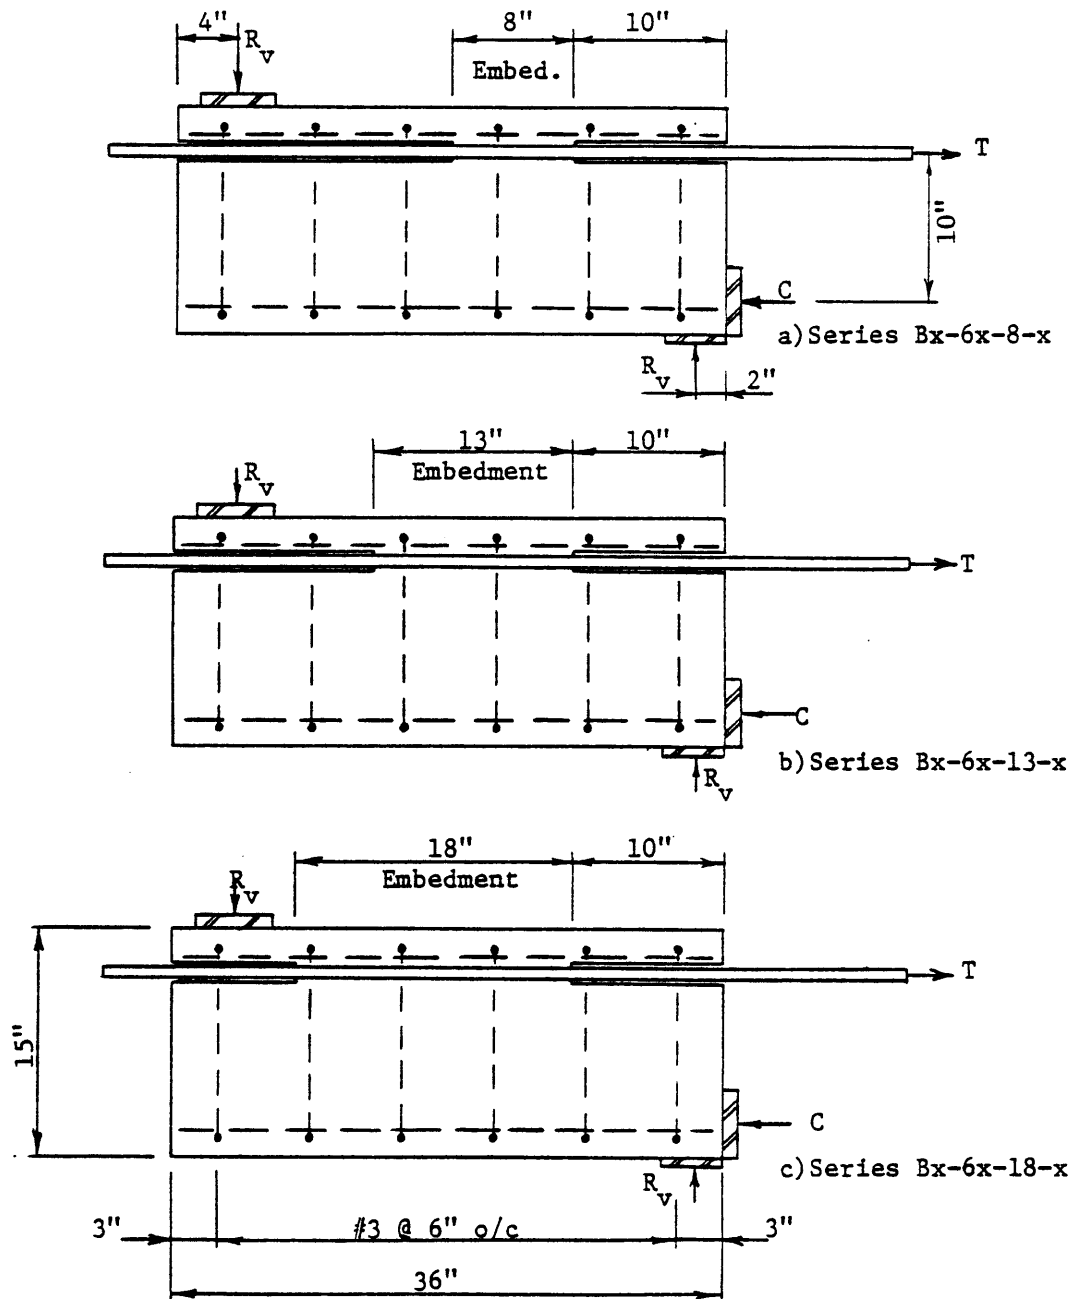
Beam End Specimen Details with No. 6 Bars
